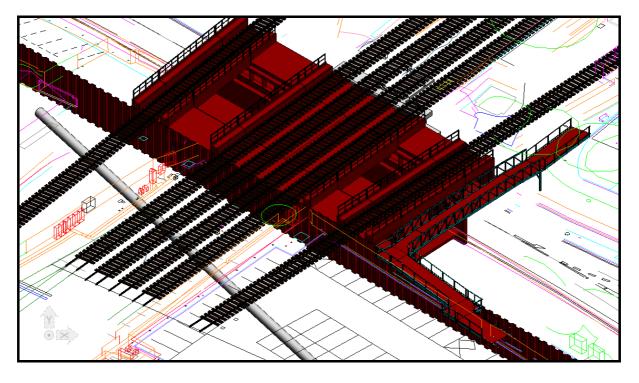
3D model extract at Botley Road, Completed Proposed Structure
